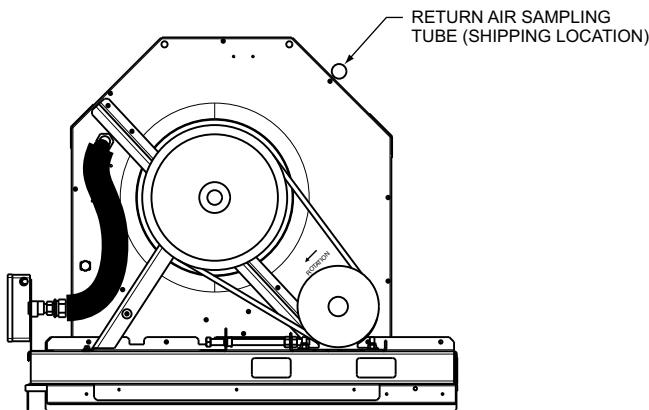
Typical Supply Air Smoke Detector Sensor Location
